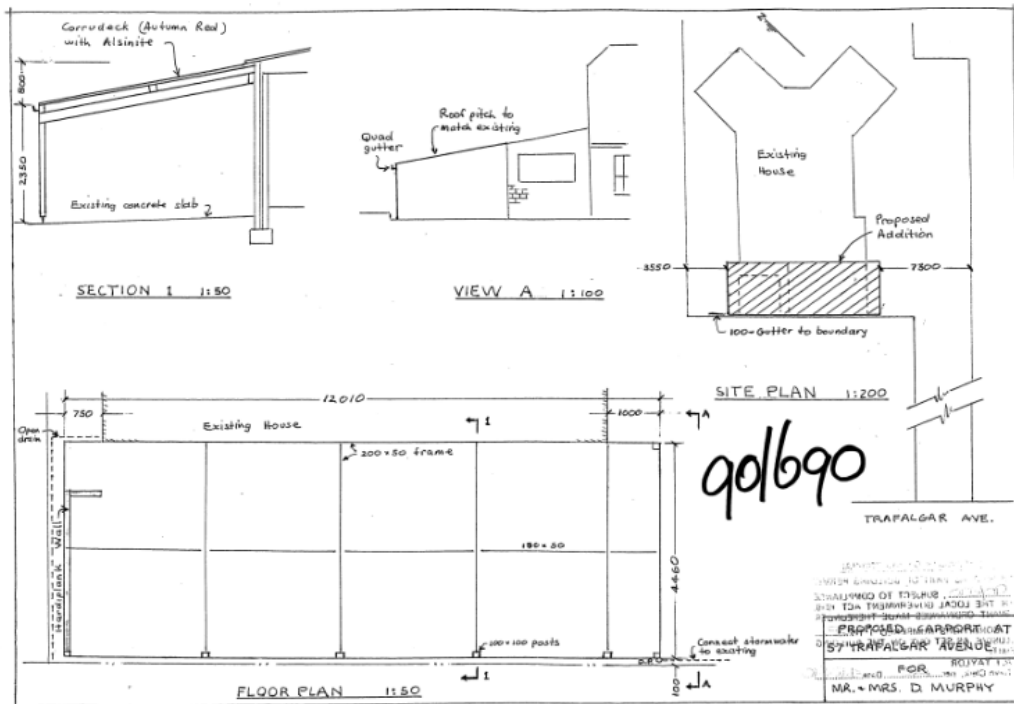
Plans indicating demolition of existing carport and construction of replacement covered carport
